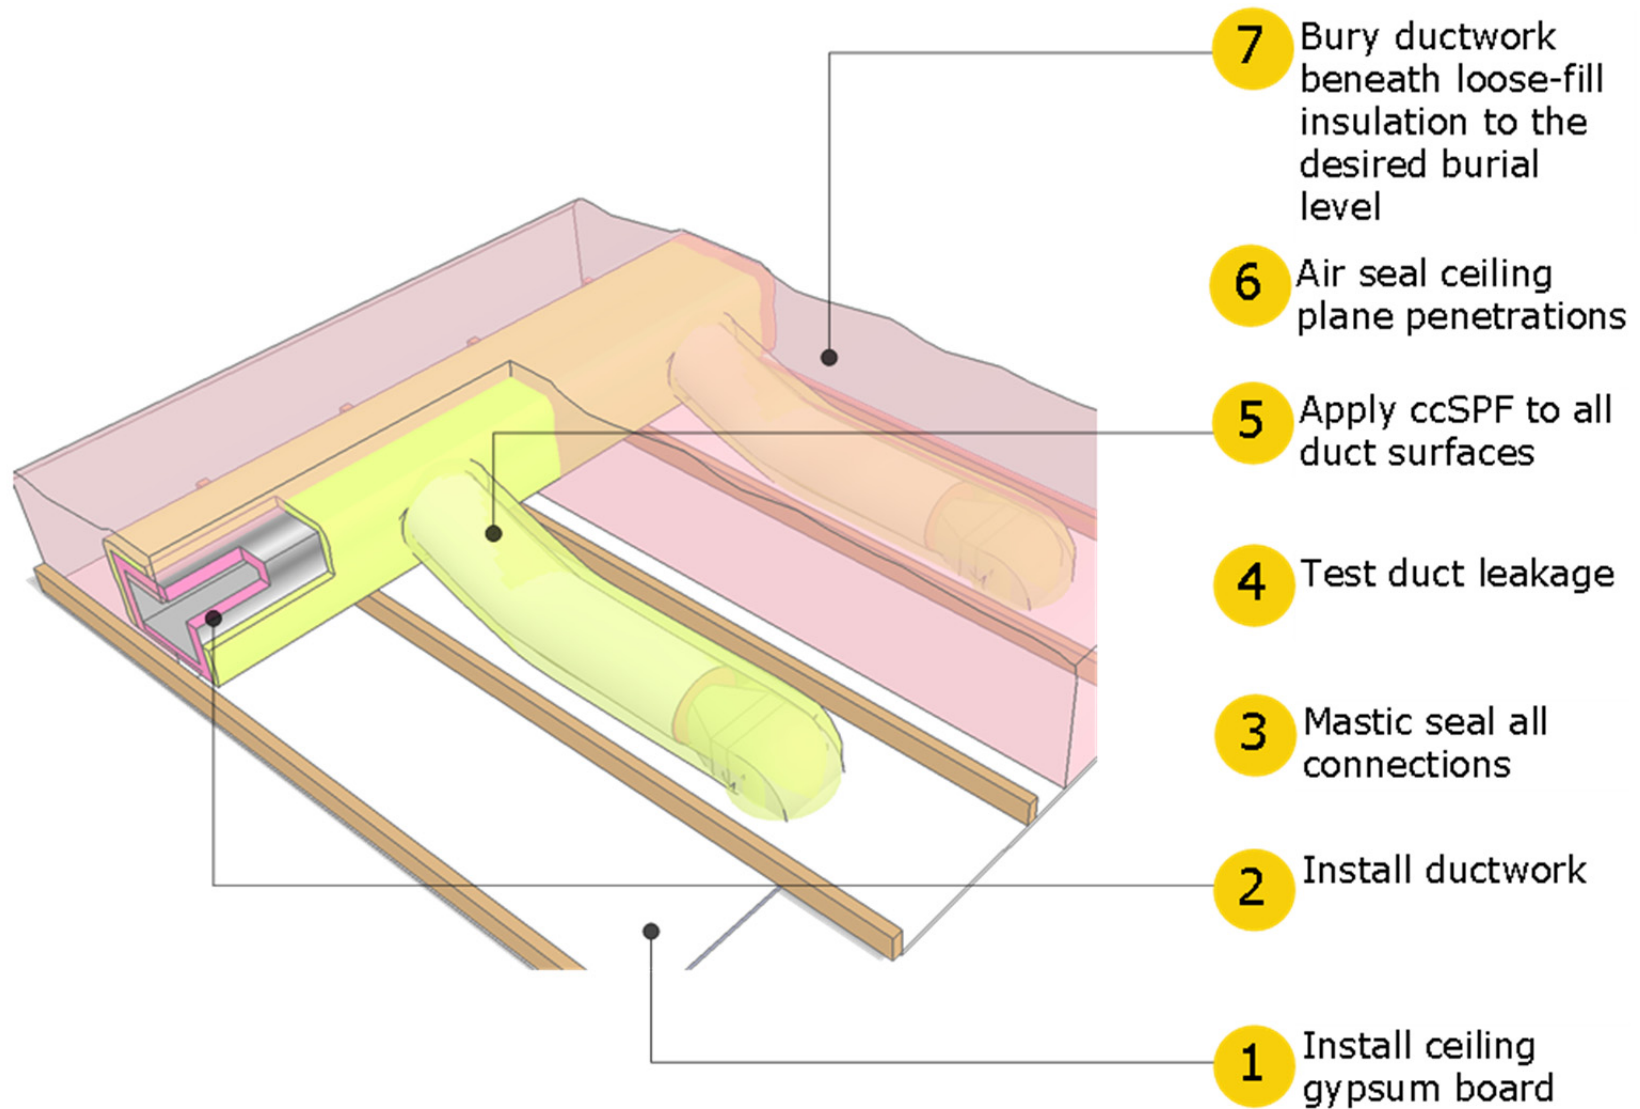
Step-by-step procedure diagram for buried and encapsulated ducts installed after ceiling in new construction
